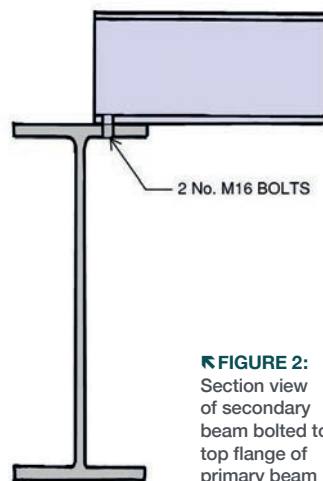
Section view of secondary beam bolted to top flange of primary beam
